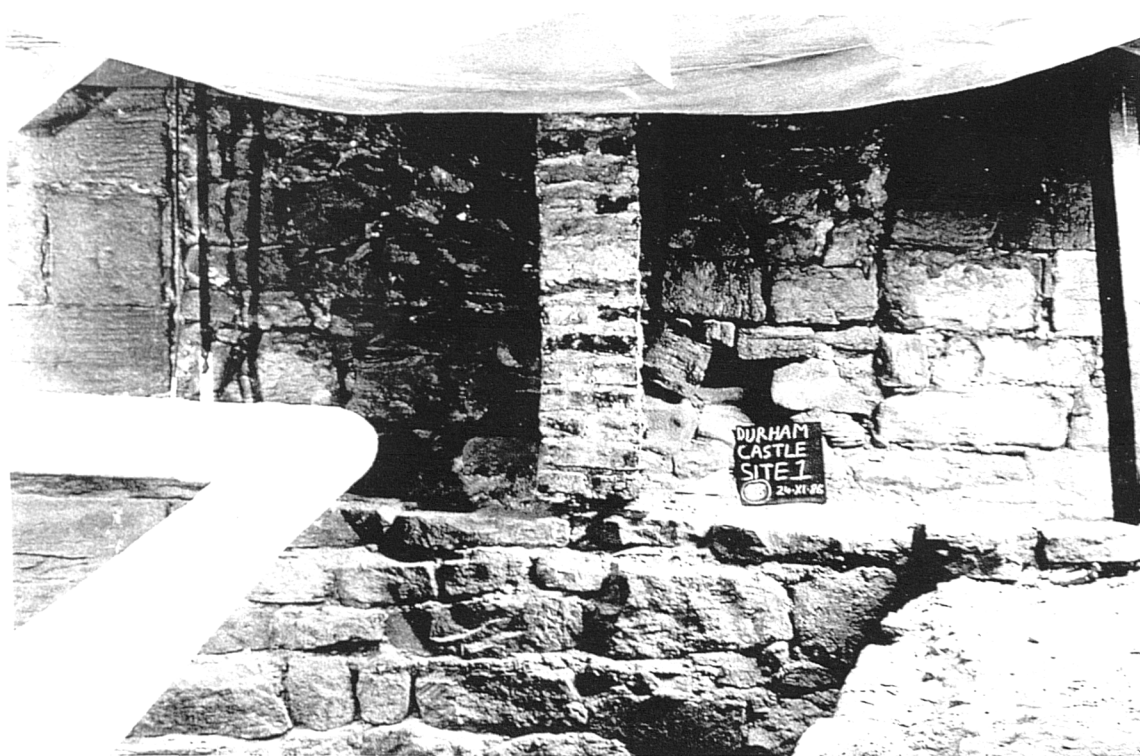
Blocked west door to Upper floor of the Chapel Building (The floor support is 18th century brick)
